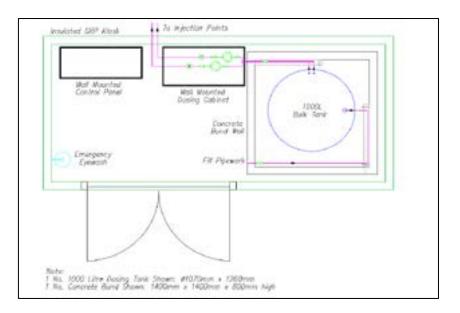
IW schematic of a bulk tank kiosk layout in H3PO4 Installation with 500 litres< bulk storage ≤ 6,000 litres.
